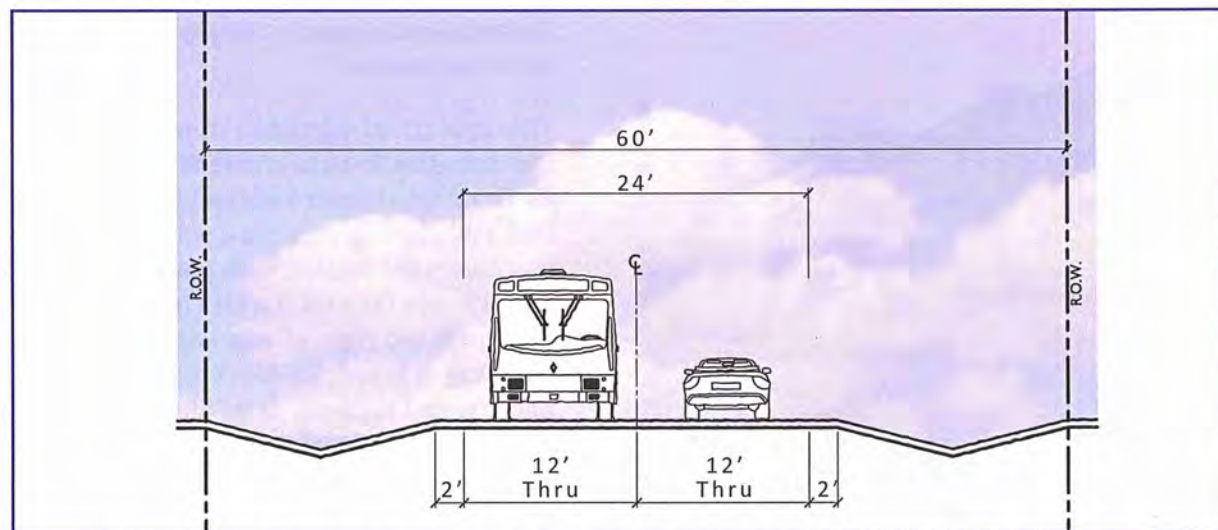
Leavenworth Avenue (Taylor Avenue to Bloomington Road); Minnehaha Avenue (Taylor Avenue to Bloomington Road)
